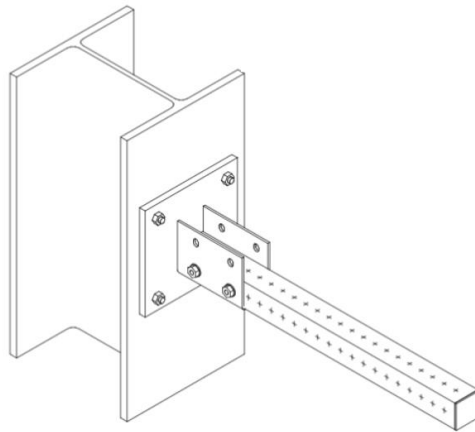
Cantilever Typical attached to a steel column by direct fastening technique.
